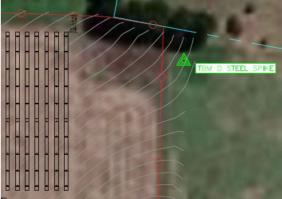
NE corner vegetation potentially impacted by fencing work (Source: original site plan)
